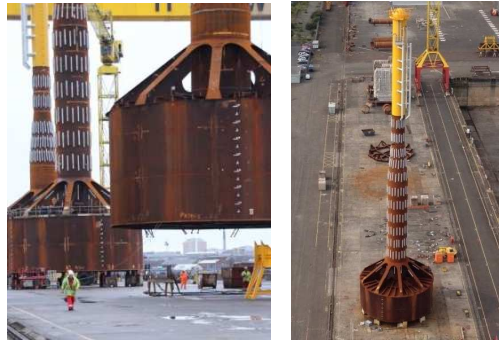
Universal Foundation bucket concept (Universal Foundation, 2019a)
